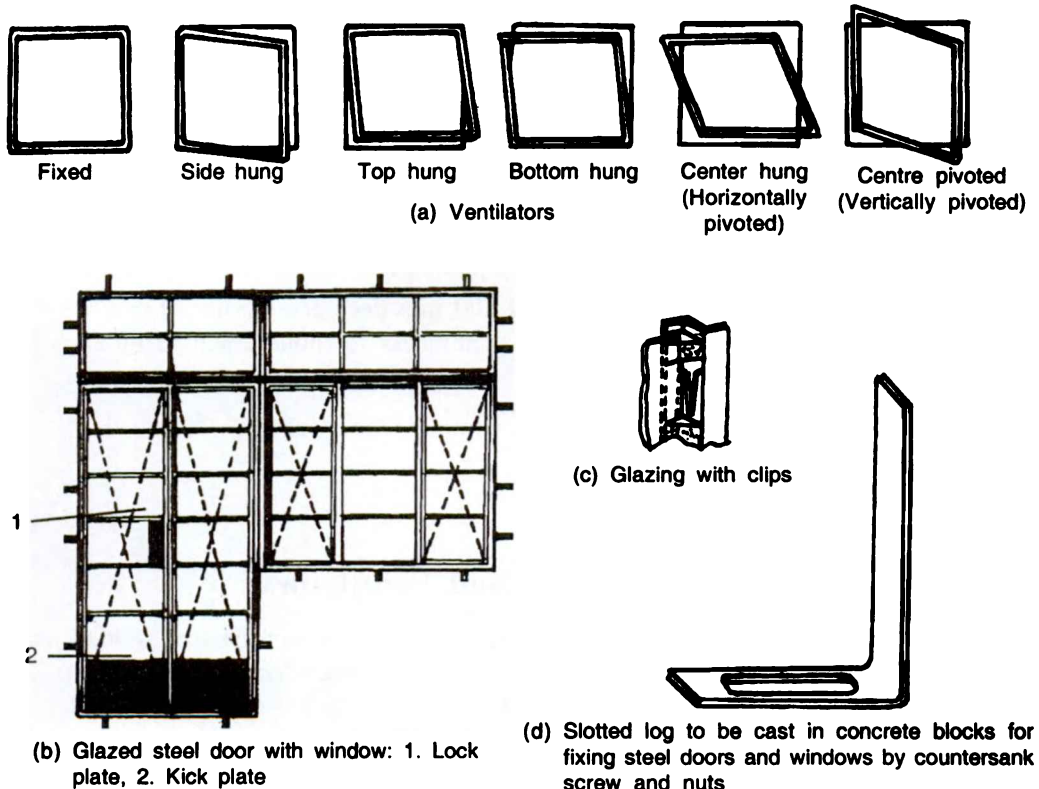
Steel ventilators and door with windows (Ref. 70).
